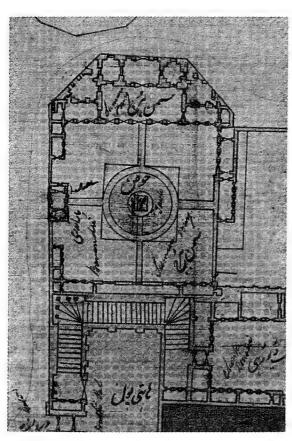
Sketch plan of Shalimar Gardens, Lahore, 1641-42.
